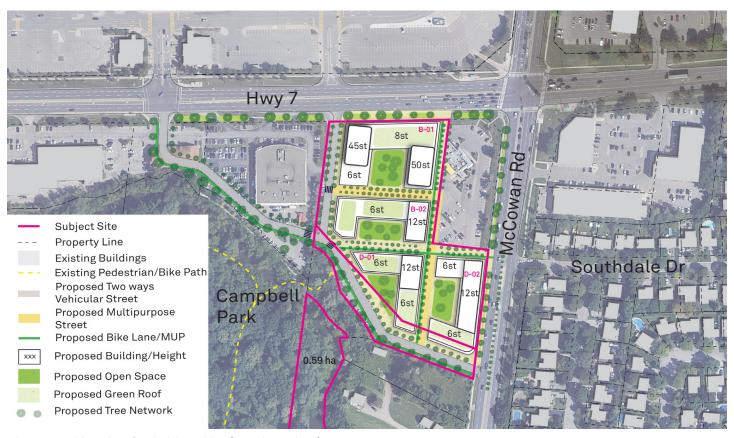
Site Plan for Subject Site (Brook McIlroy)
